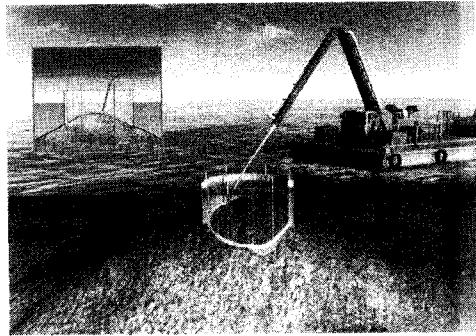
Filling the gap of connecting points between the rubber caisson and the rock
